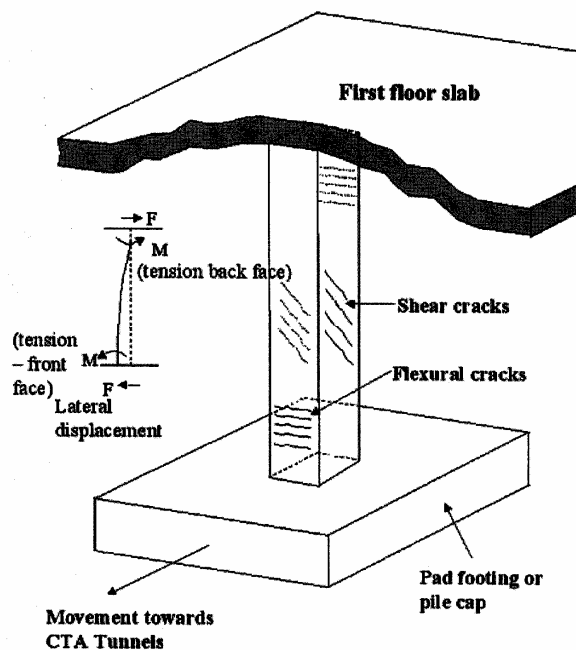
Typical cracking in row of columns due to ground movement towards a tunnel (Powderham *et al.*, 2004)
